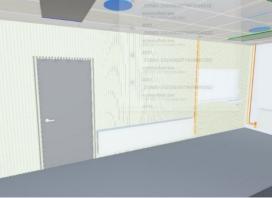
Site/BIM pair of an architectural wall with door, window, radiator, and pipes
